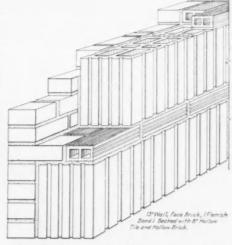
Type of Wall Used to Carry Heavy Loads, Bonded Every Fifth Course, Backed with Hollow Brick.
